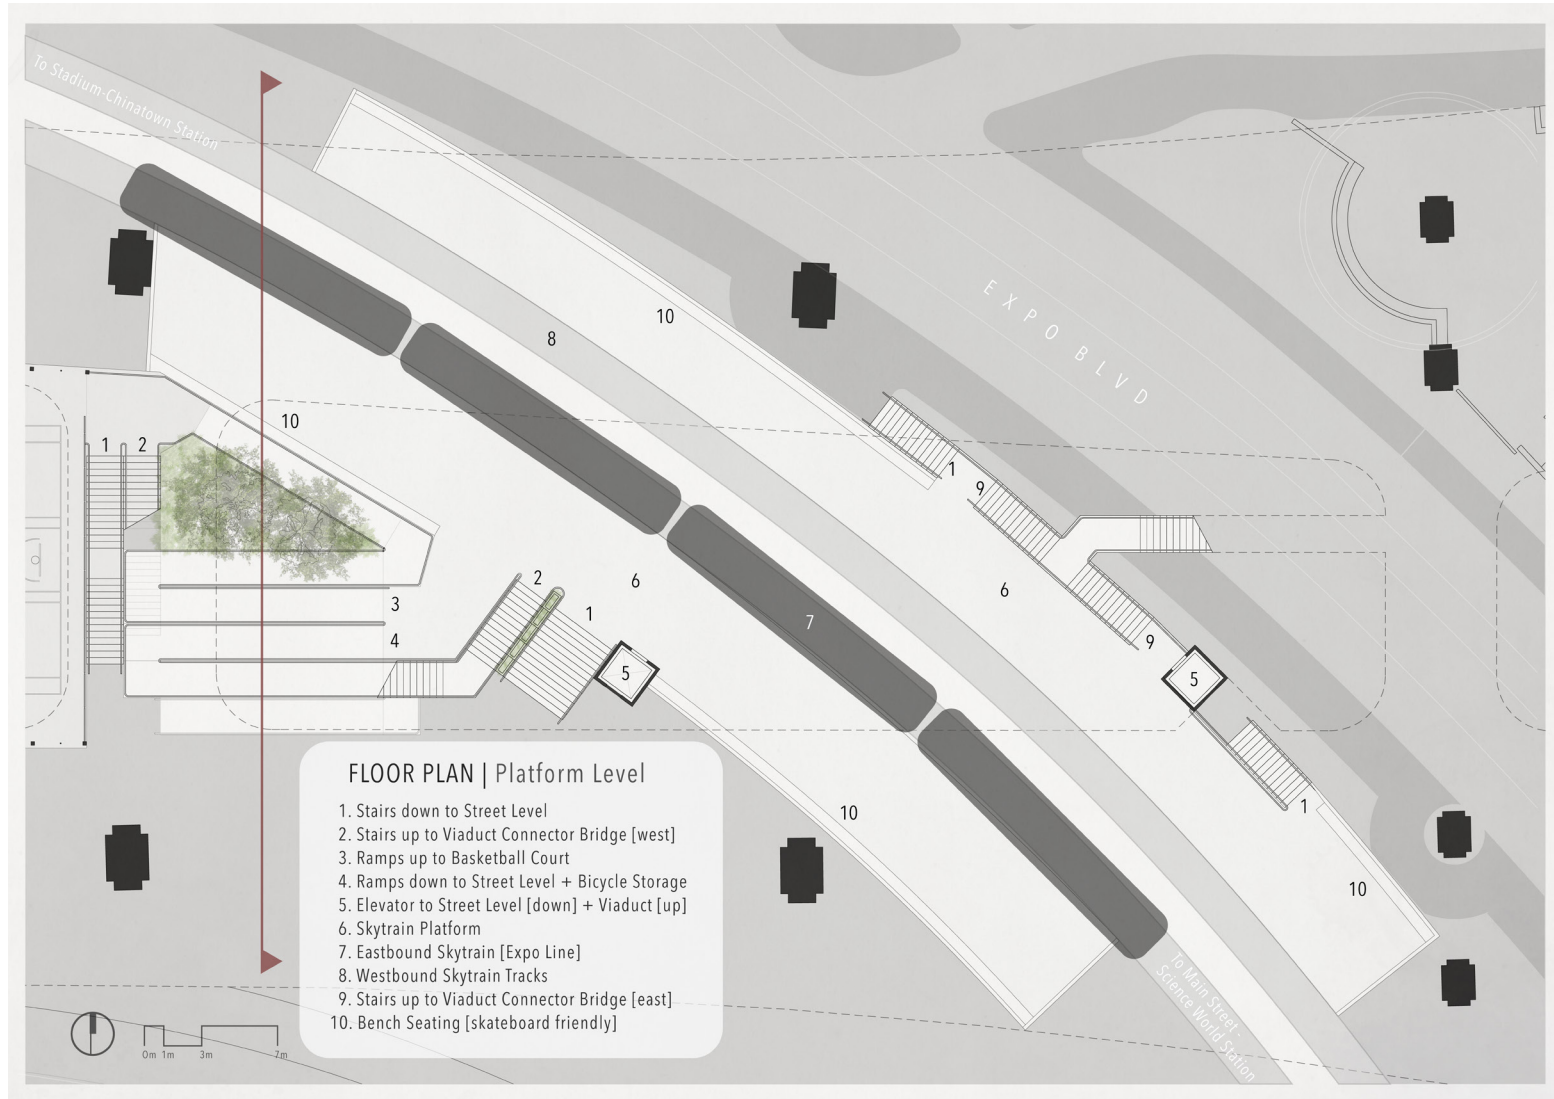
Site/Floor Plan for Node 2: Viaduct-Plaza Station.
